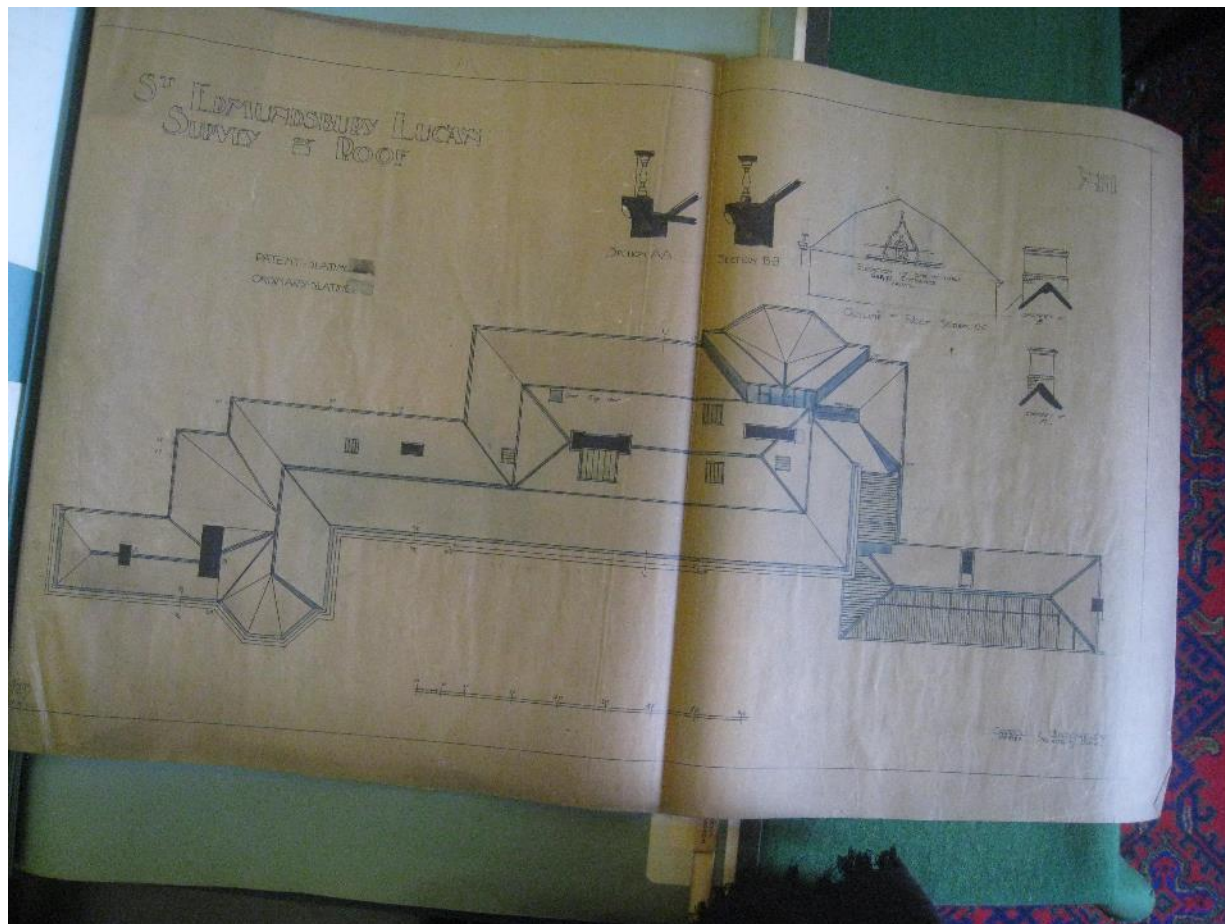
1902 Survey of the roof. The east wing is rectangular in layout contrary to how it is today. Nowadays, this wing replicates the bow window to the west. This layout shows that the east wing predates the west wing which was built between 1902 and 1913. Source: Survey of roof by Carroll and Batchelor architects
